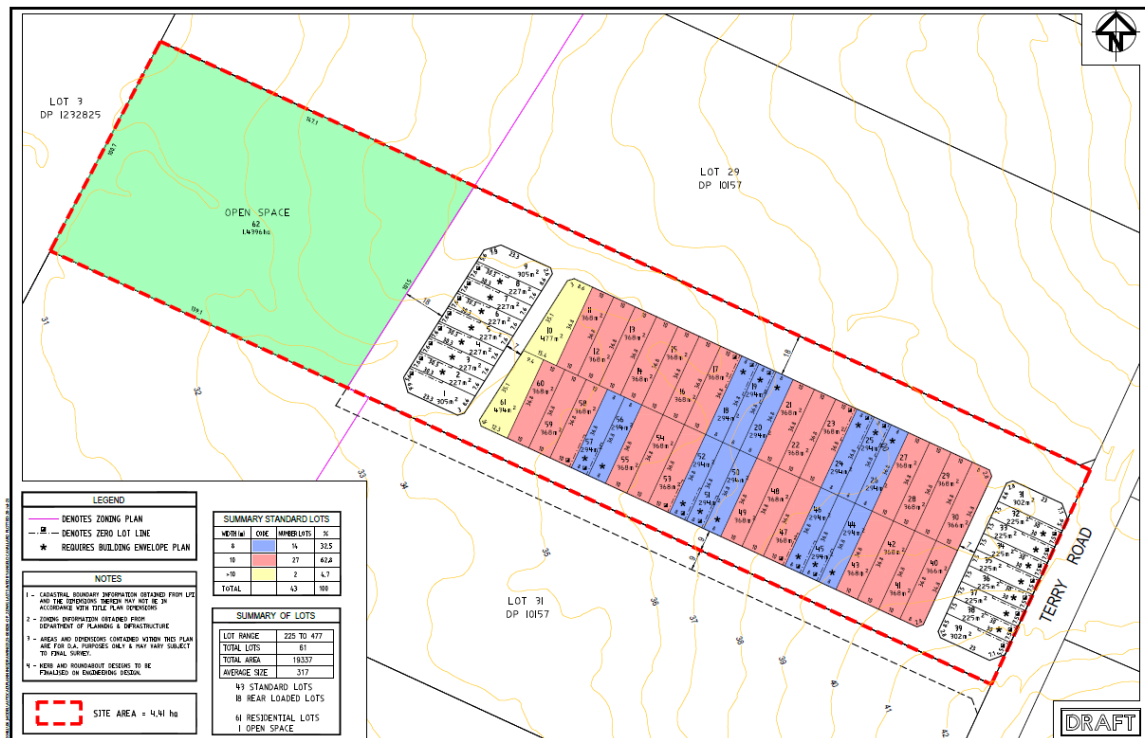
Concept subdivision plan showing 61 residential lots (Source: Egis 2023)
